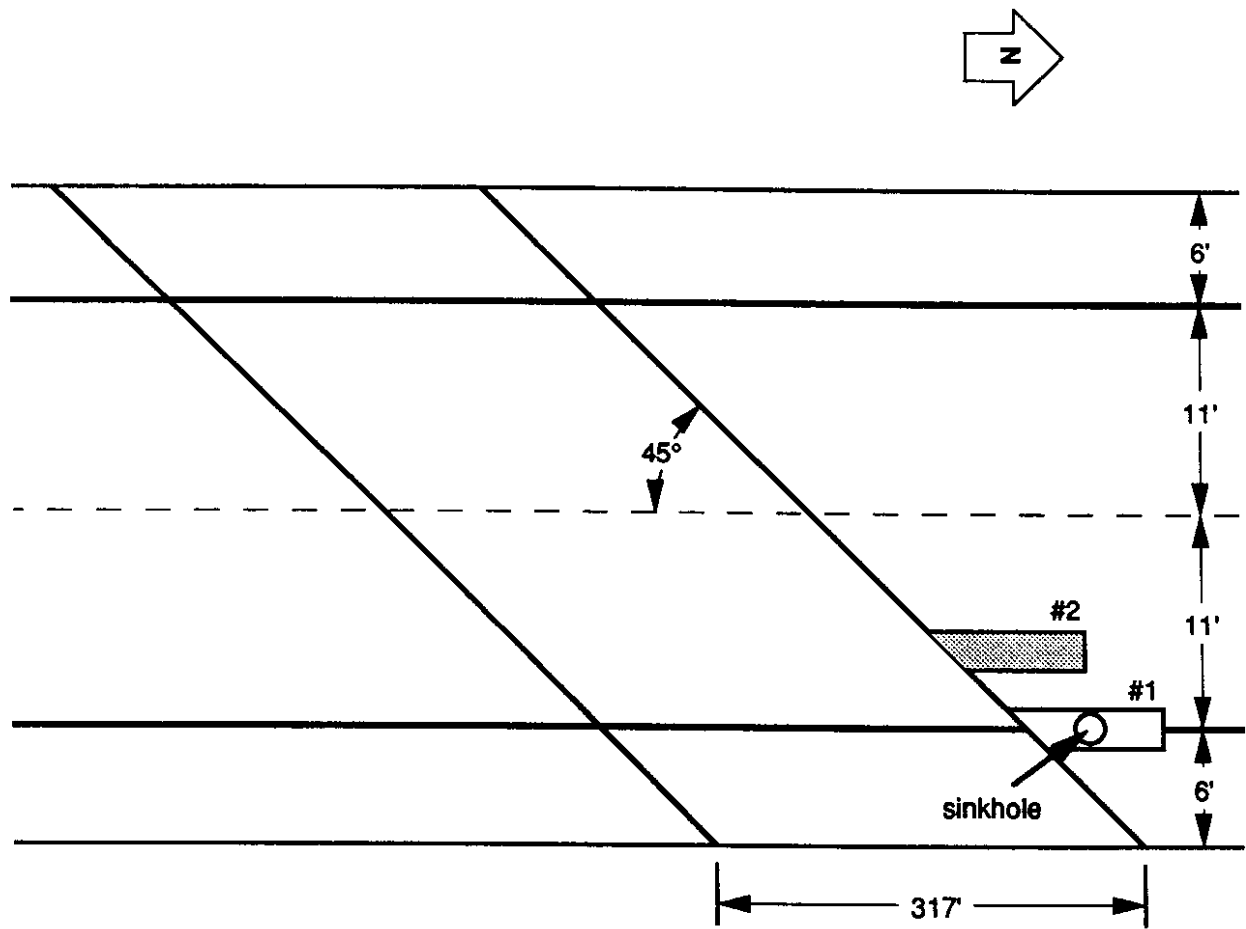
Location of Test Section in Southbound Lane of the Johnson Road Undercrossing
